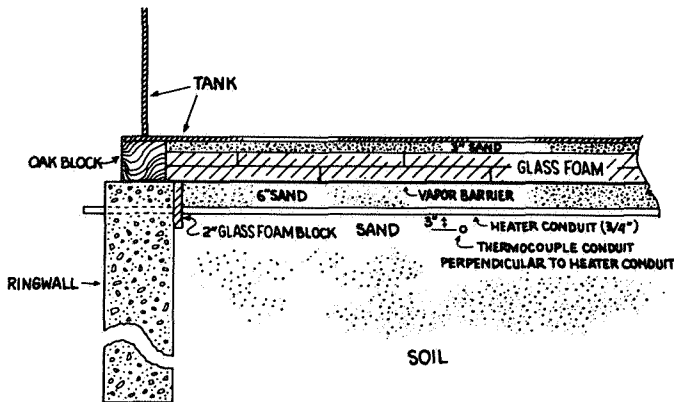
Typical foundation, insulation, and heater system for a single-wall ammonia storage tank, atmospheric pressure.
